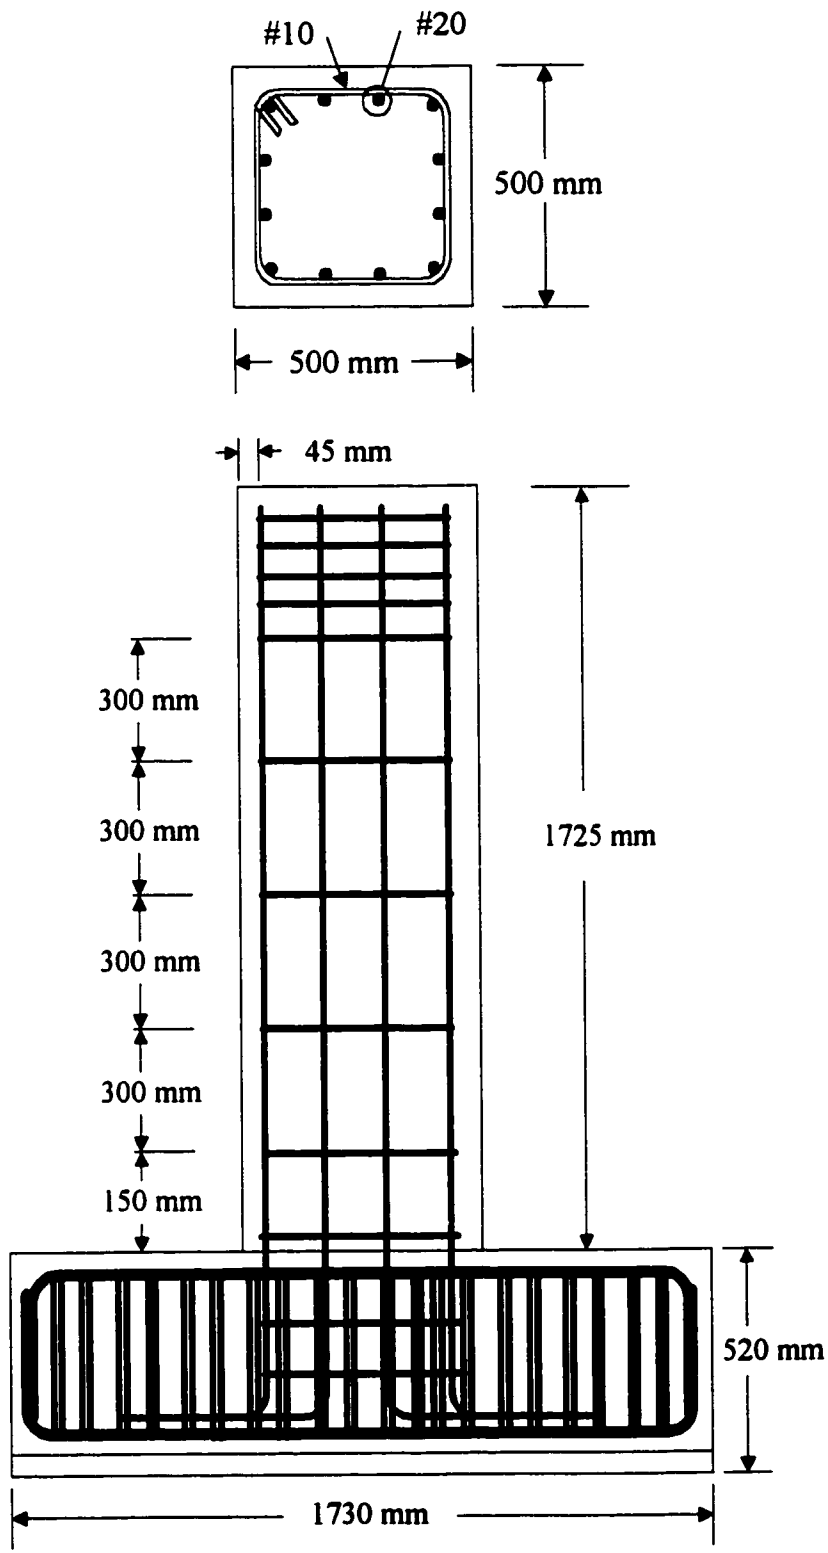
Dimensions and reinforcement details for columns BR-S3 and BR-S4
